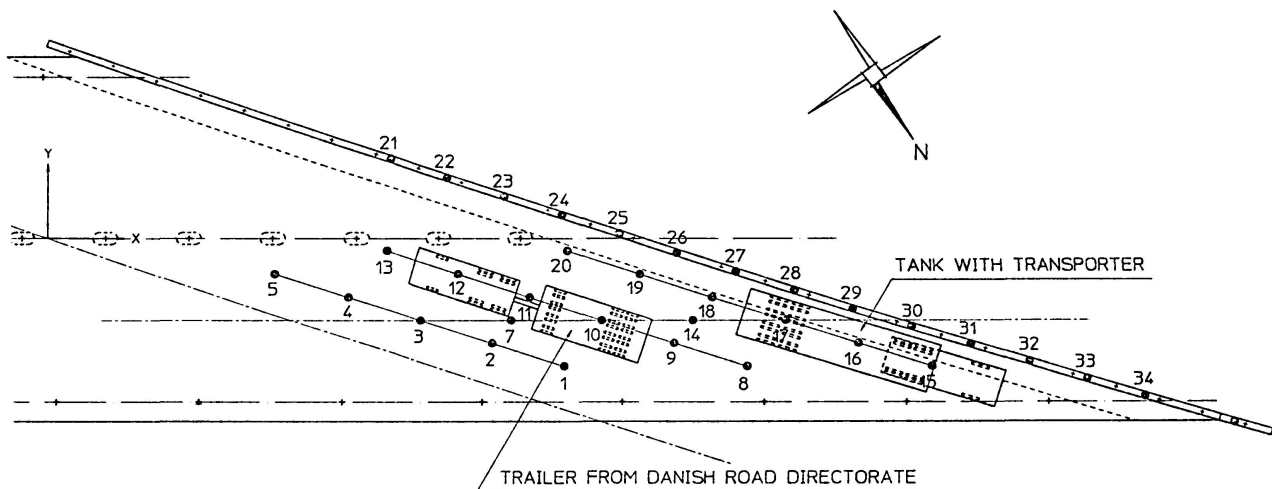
Typical set-up of the heavy vehicles (Test no 18).
